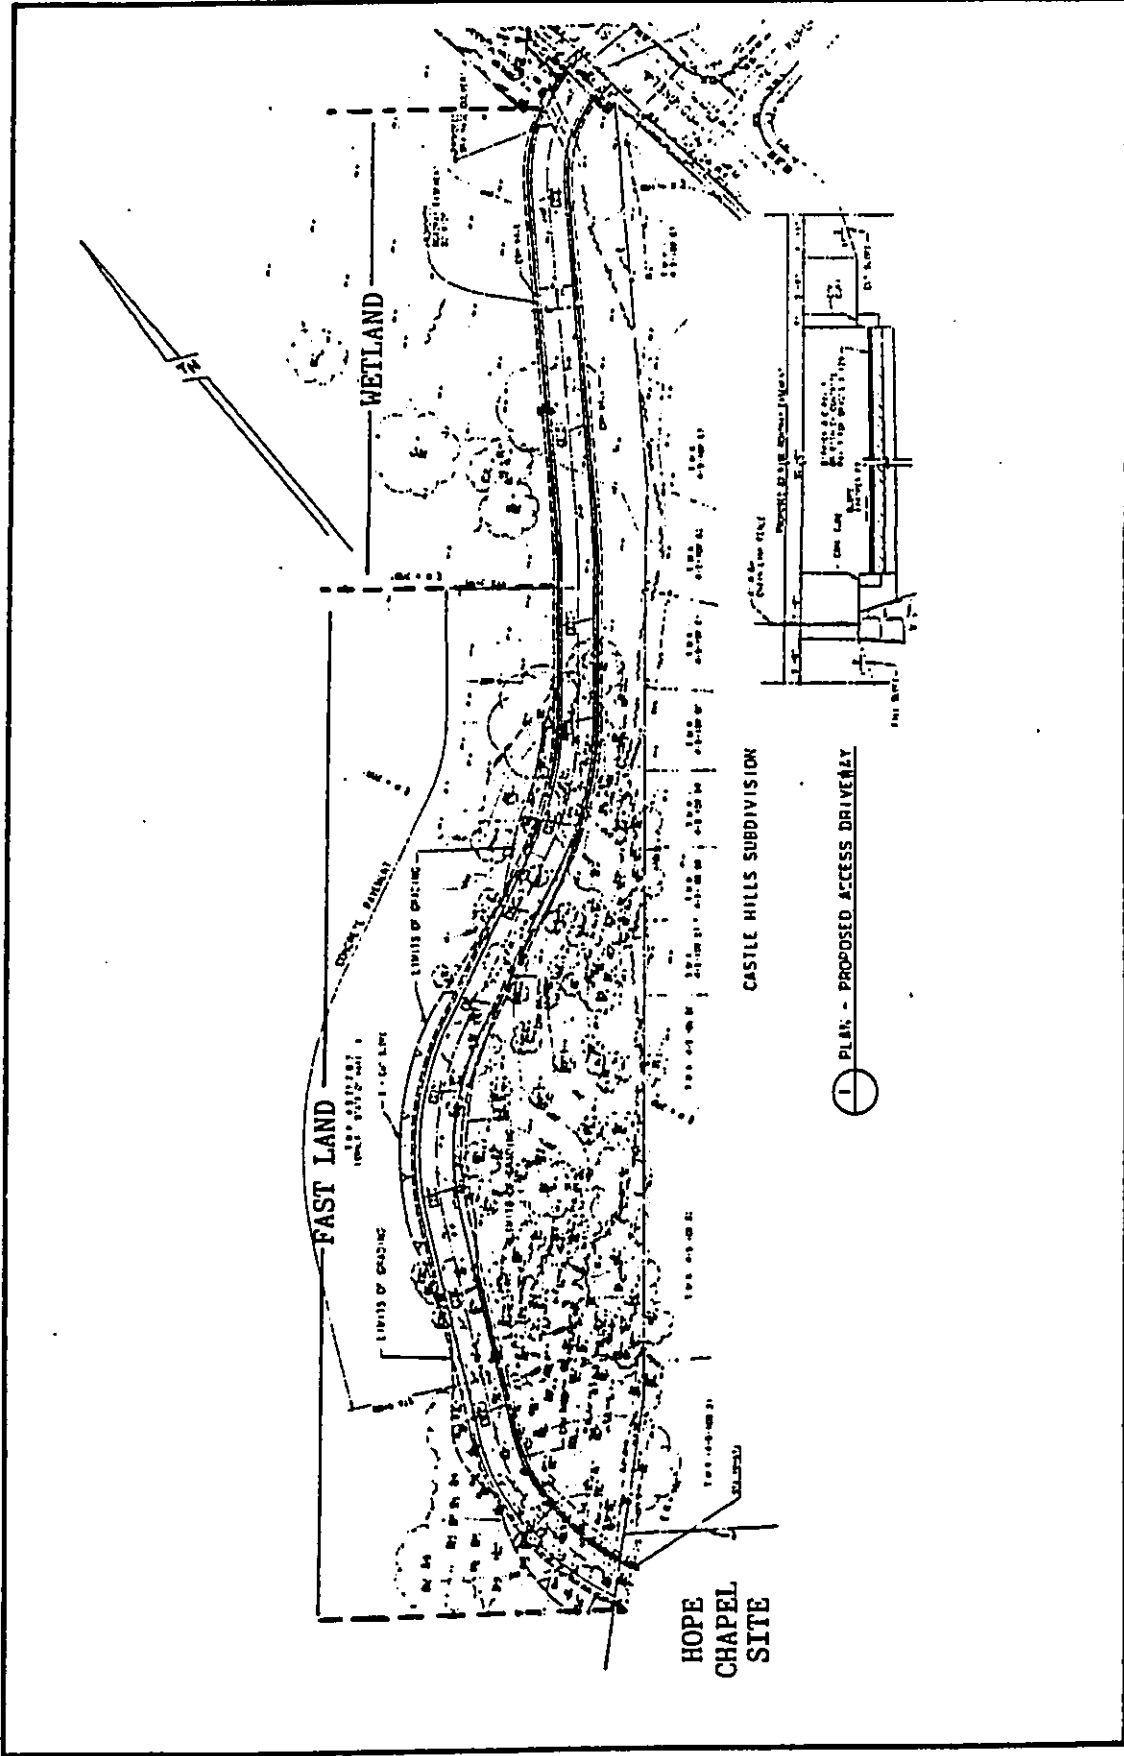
PROPOSED ACCESS DRIVEWAY FROM PO'OKELA STREET TO HOPE CHAPEL SITE.
